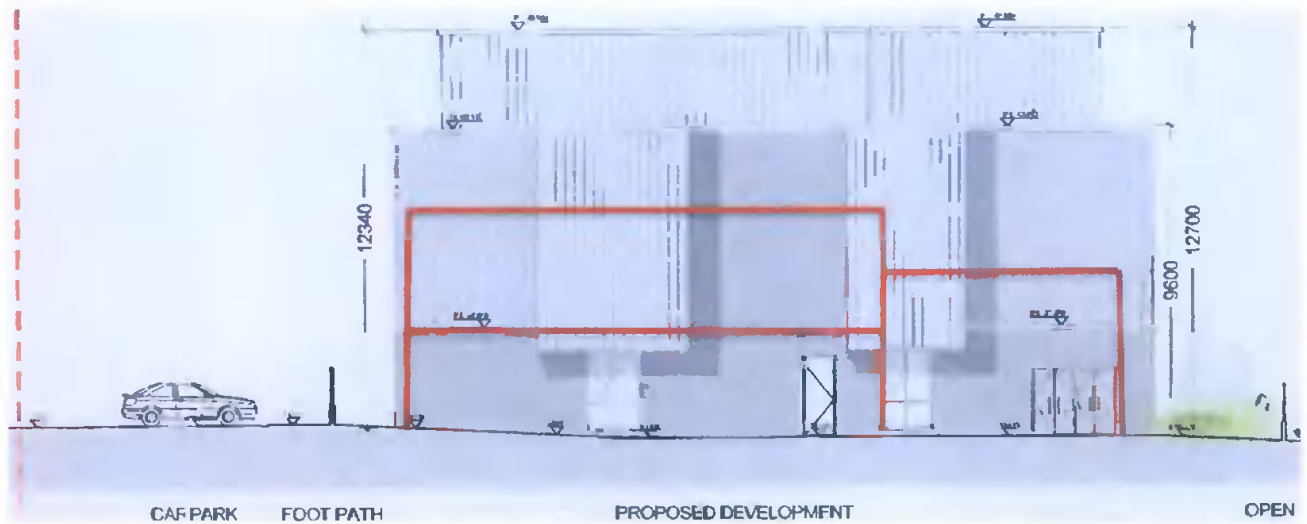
Side elevation of the proposed development when viewed from Tuckers, 2m from boundary
